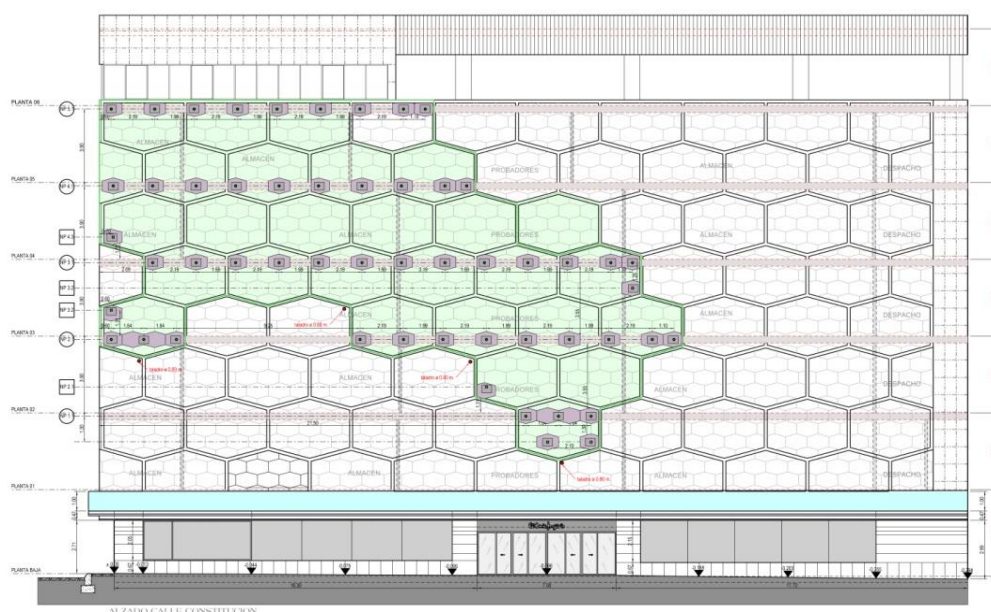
Clamping structure on the north façade - Green facade in the Corte Inglés (Source: El Corte Inglés).
